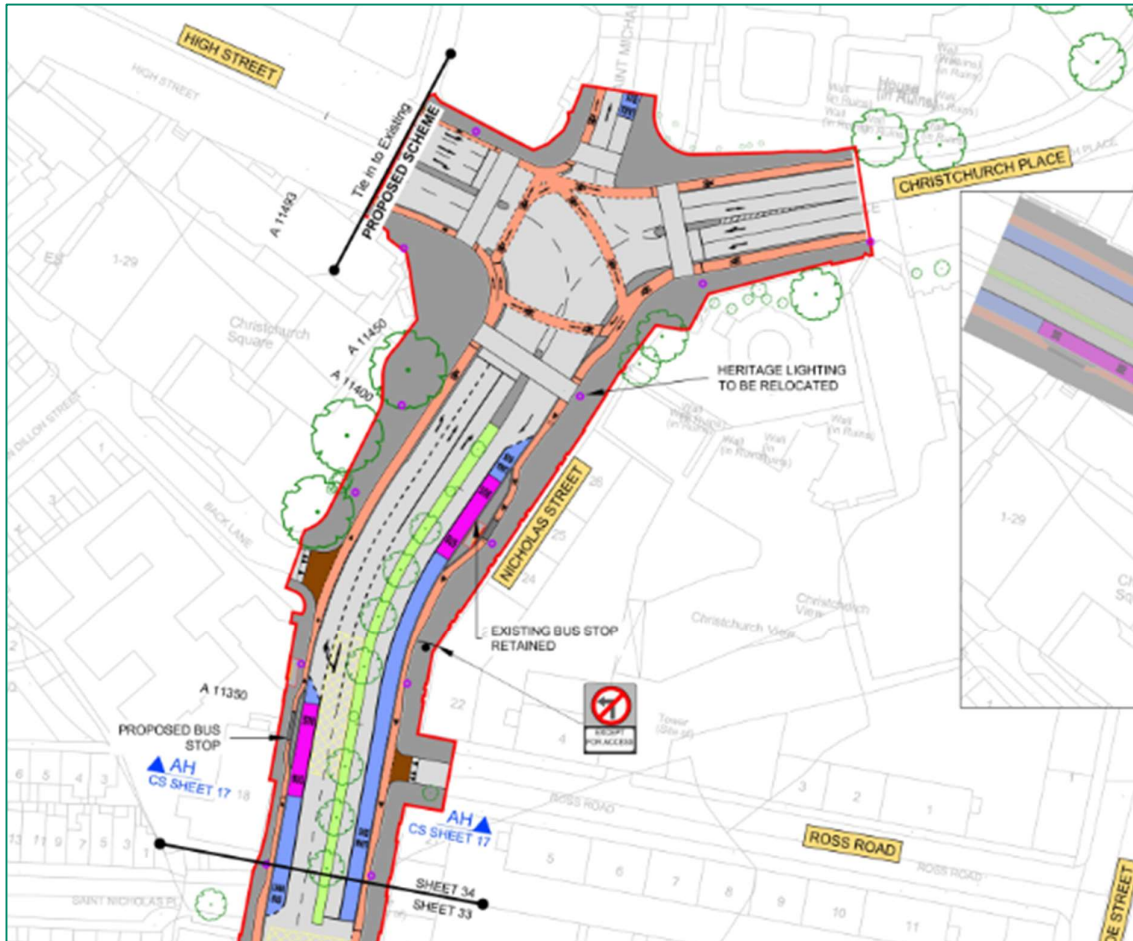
Extract from General Arrangement Drawings at Nicholas Street / Christchurch Place junction (Sheet 34)
